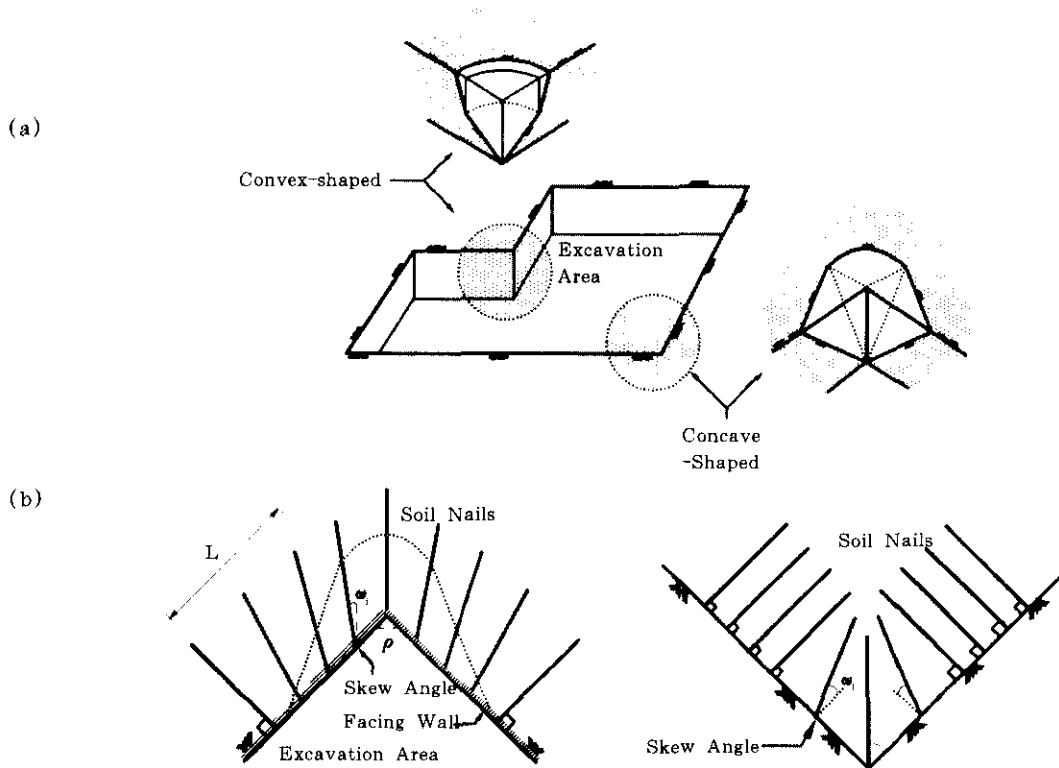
A schematic representation of the irregularly shaped excavation corners with skew soil nailing system
